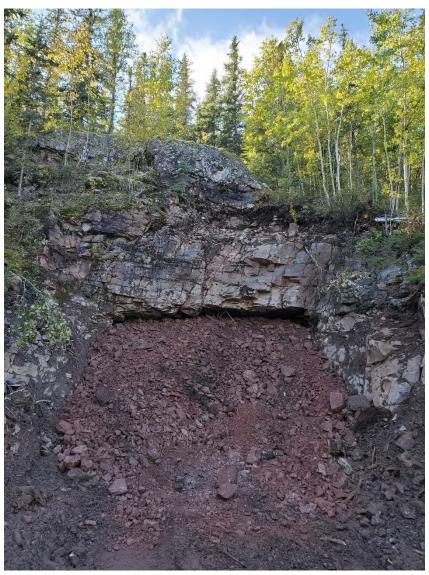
Stages of Backfill placed in the Fishhook Bay Adit
